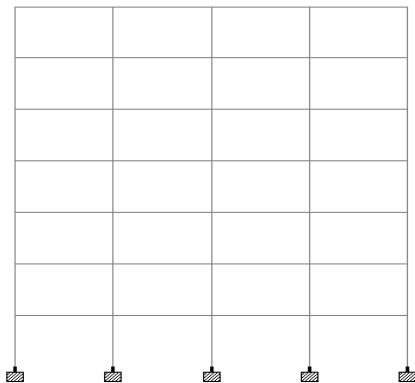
elevation of view of building Without soft story in STAAD.Pro
